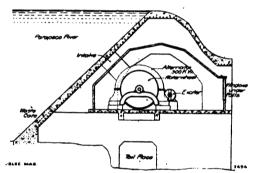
Section showing Dam Construction and the Power House and Plant in its Interior.
